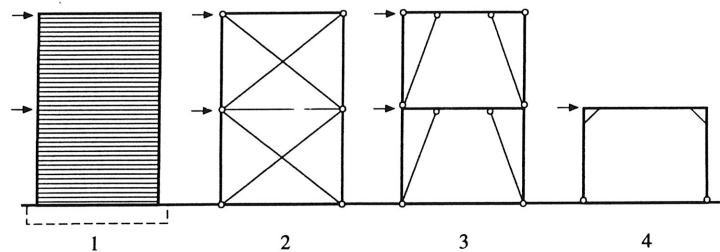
Vertical bracing elements. (1) Shear walls (timber, brickwork, concrete), (2) crossed diagonals, (3) portal frames, (4) knee-braced frame.
